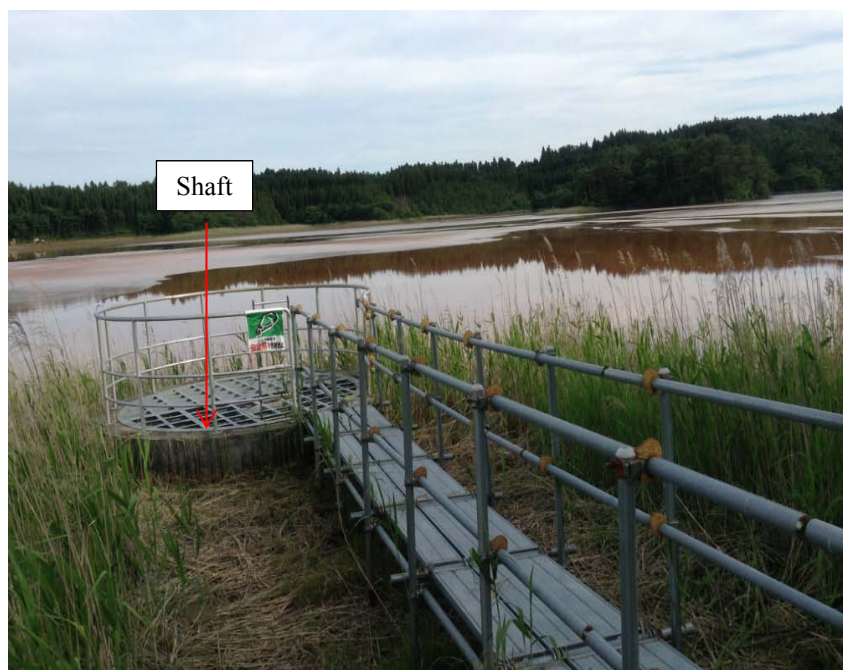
Emergency Facility – Shaft for water drainage in tailings dam
